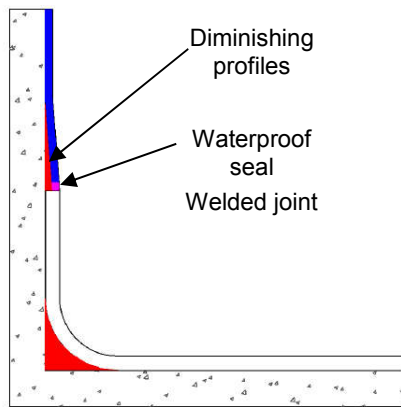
PVC flooring upstand: weld/joint with diminishing profile or filler
